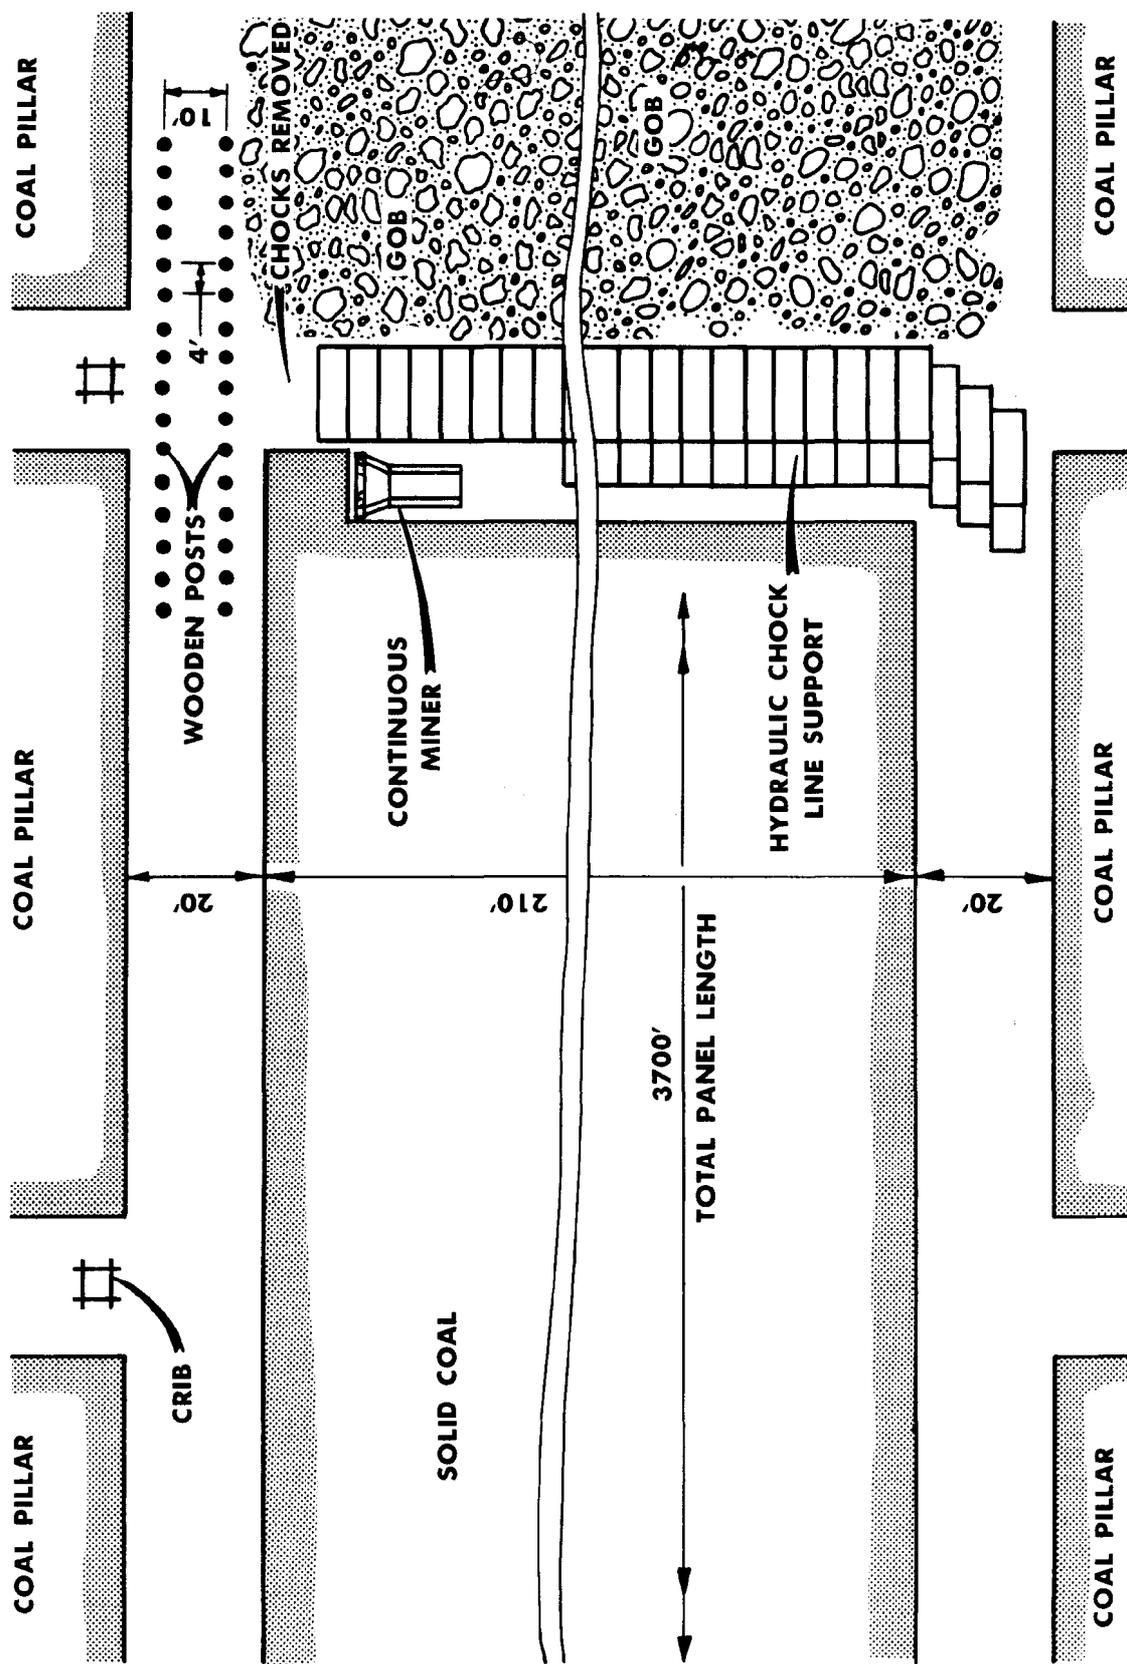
Mine VaB - Plan layout of shortwall section.
